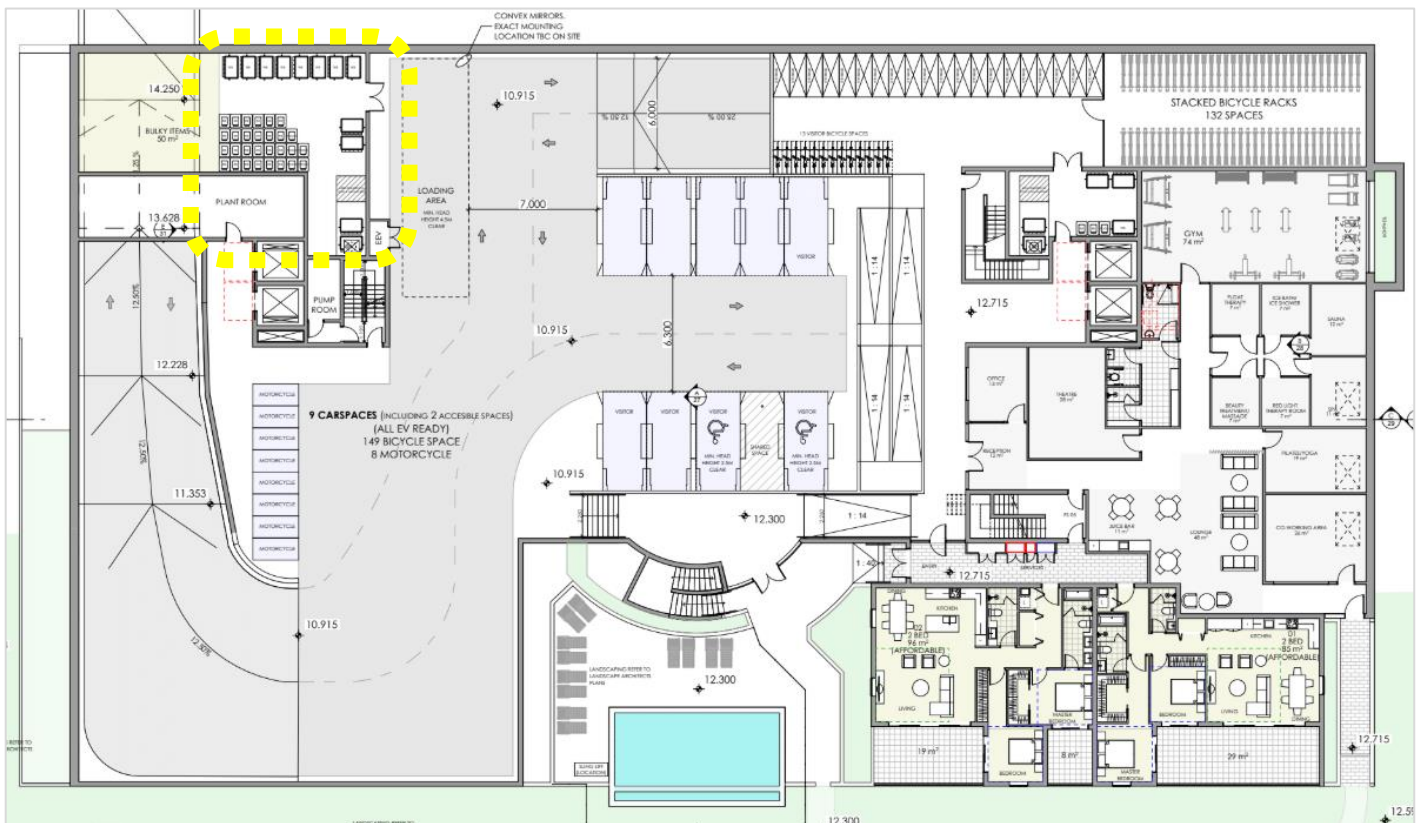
Extract of basement/lower ground floor plan with new location of waste storage facilities outlined yellow (Source: PTI/PPUD)
